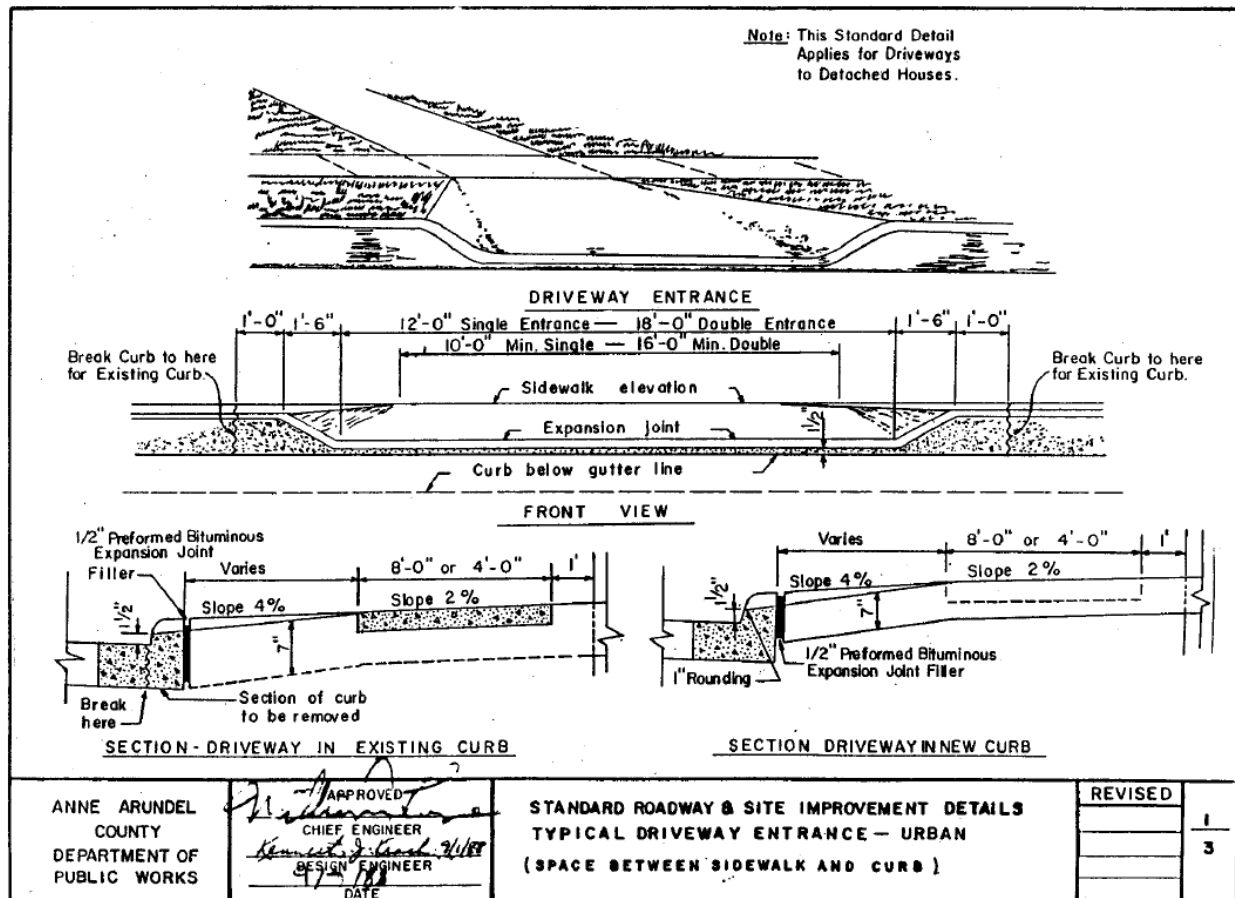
County Standard for sidewalk remaining at grade while crossing a driveway
